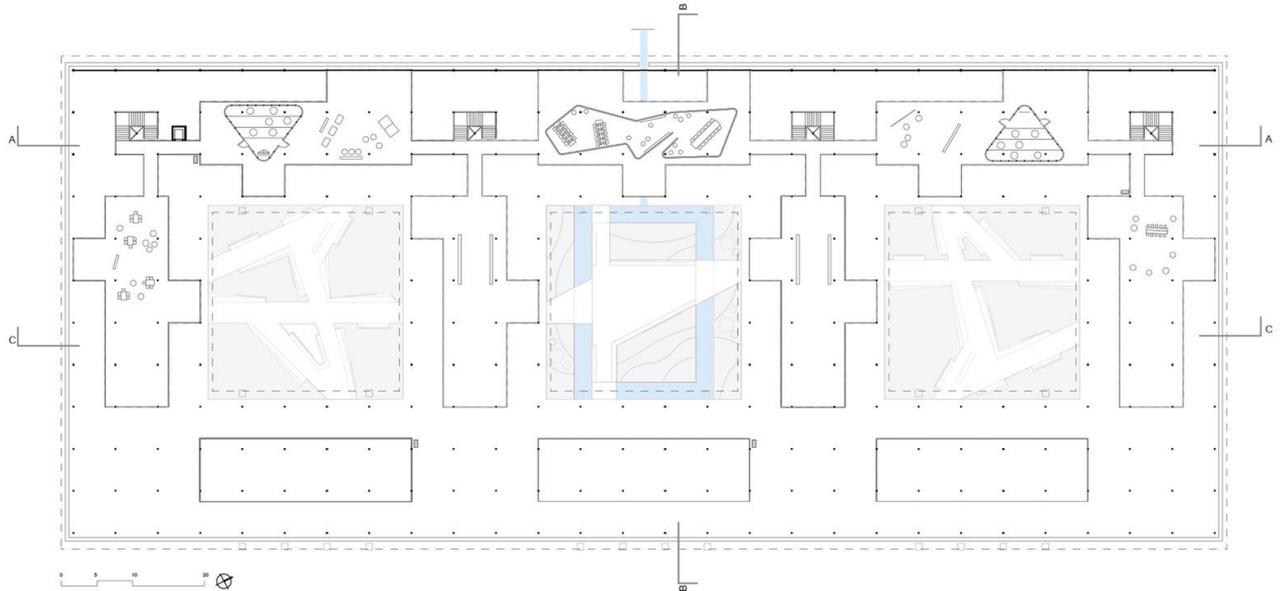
First floor plan (Leonardo Finotti - www.archdaily.com)
